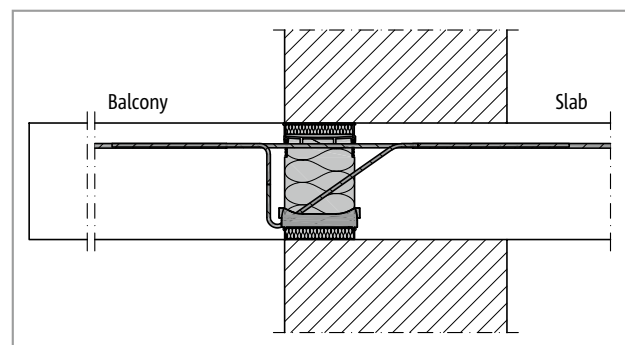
Schöck Isokorb® XT type K: Connection with single-leaf masonry
